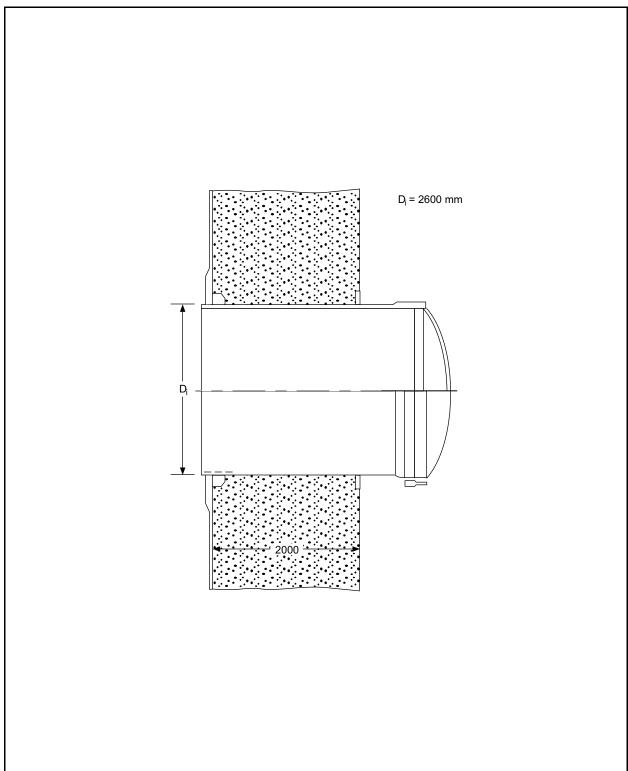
Reactor Building—Containment Upper Drywell Equipment Hatch
